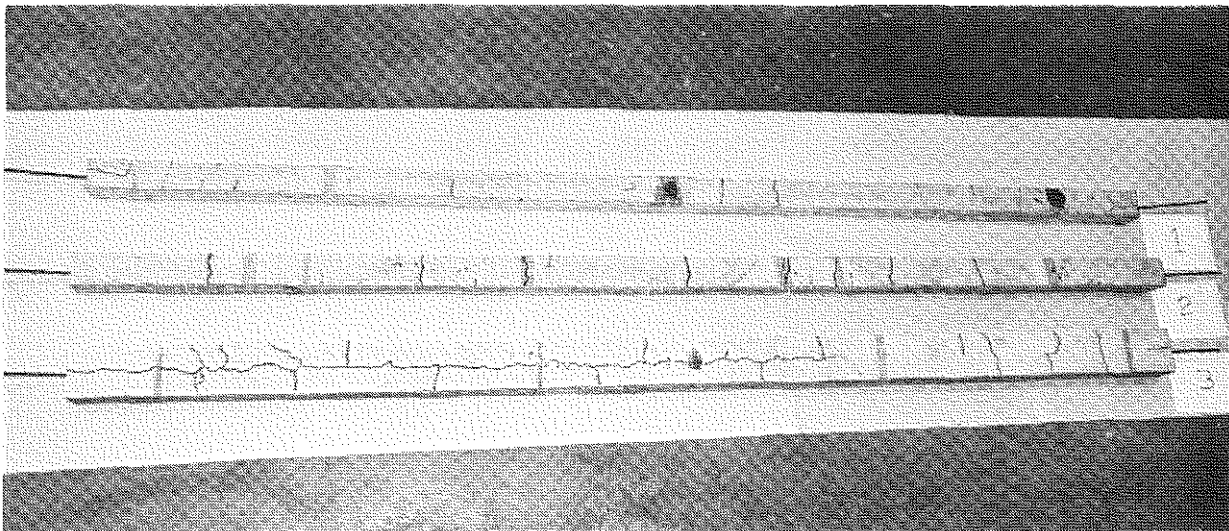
Test Beams Showing Cracks (Lined) Induced by Warming Reinforcing Steel (by Resistance Heating).
